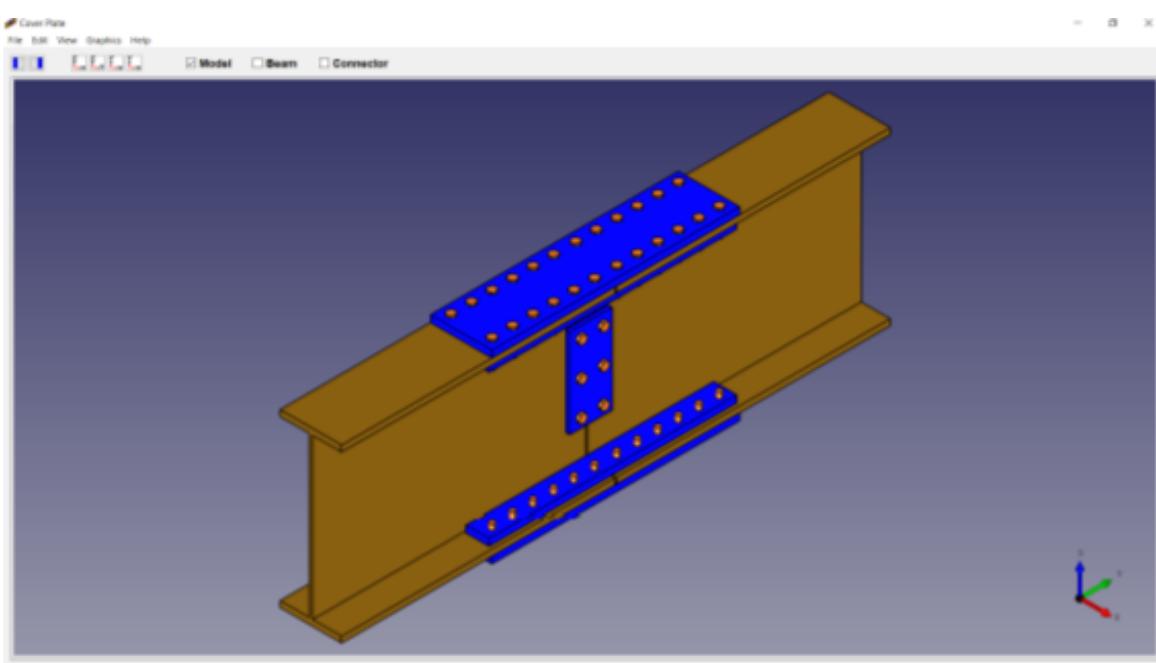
3D drawing output of typical Beam-Beam Cover Plate Bolted connection
